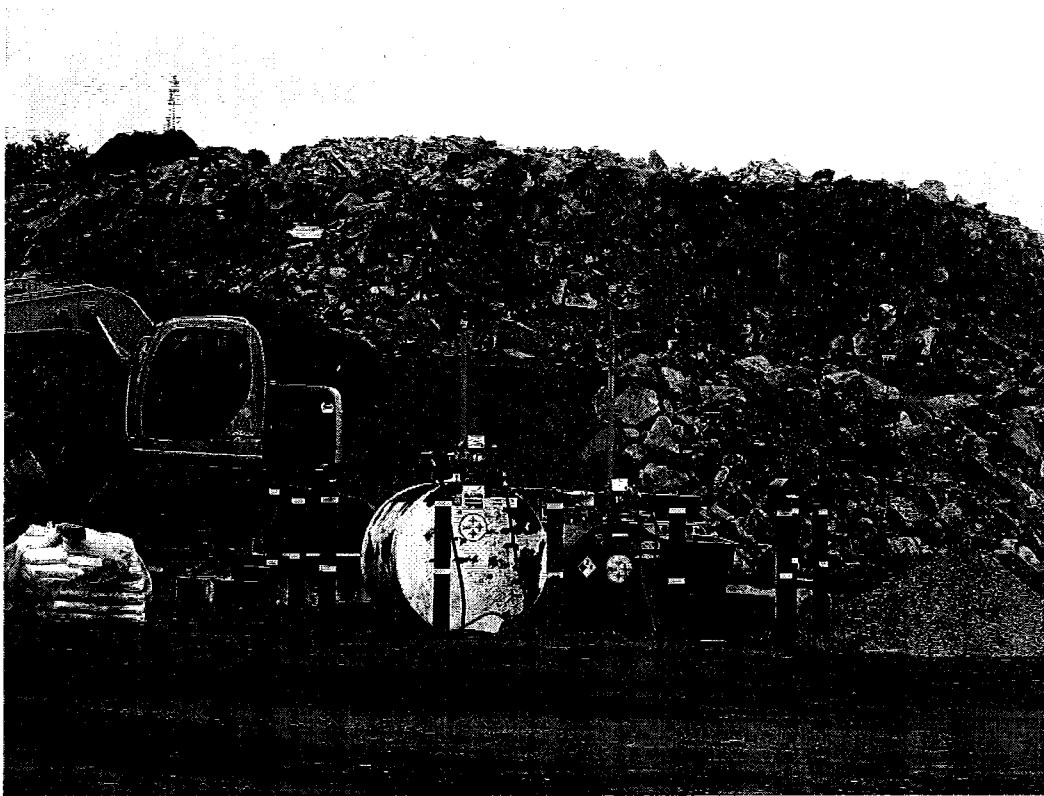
Looking northwest, across western end of site; at stormwater swale.
